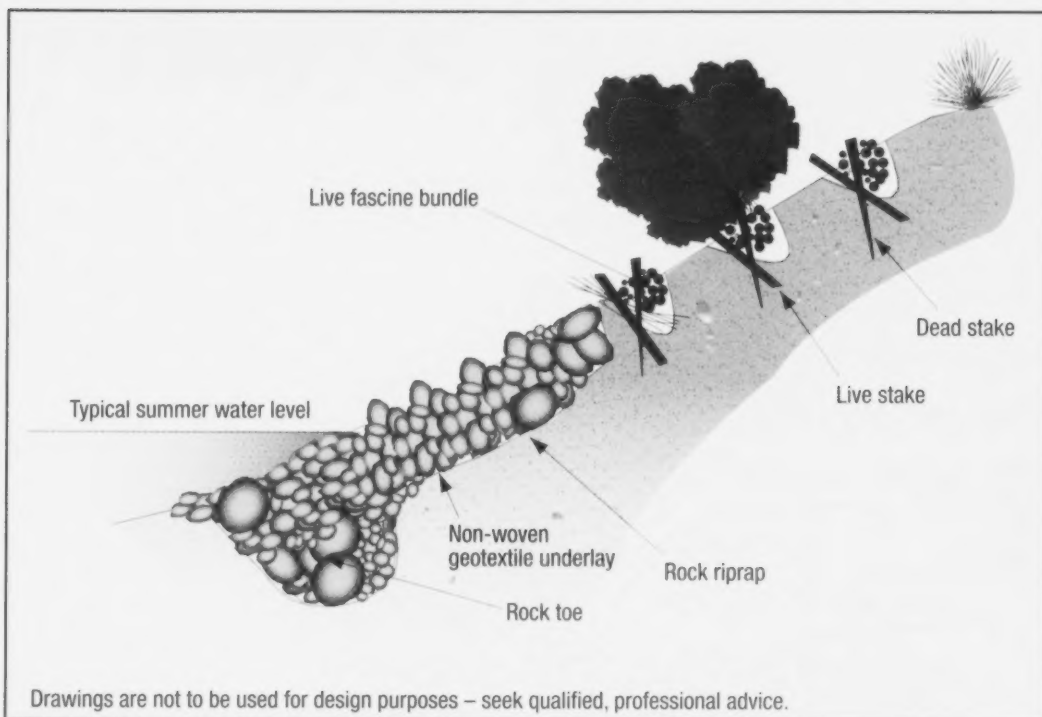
Bank Protection with Rock Riprap and Bioengineering
